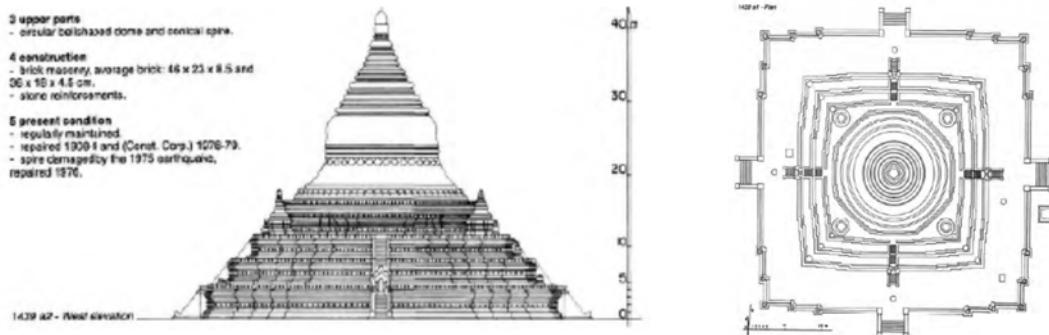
Elevation and plan views of a typical Stupa (Pichard, 1992)
